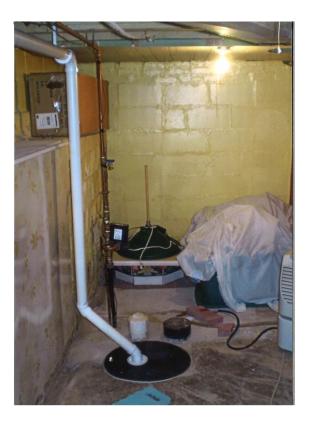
Looking east at completed Pickup Point B and PVC pipe
